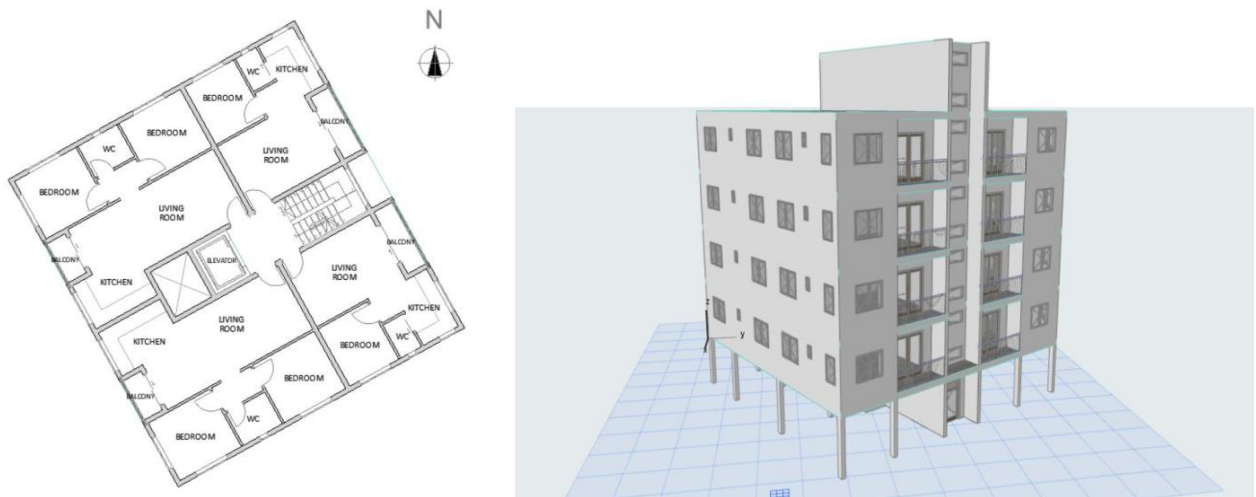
Plan and 3D model for Uzun 10 Apartments (Author)
